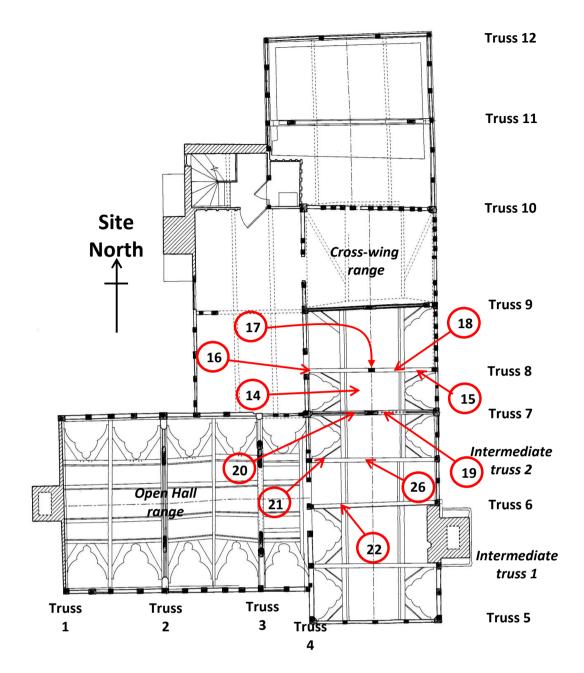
Plan at roof level to help locate sampled timbers (after Ric Tyler)
